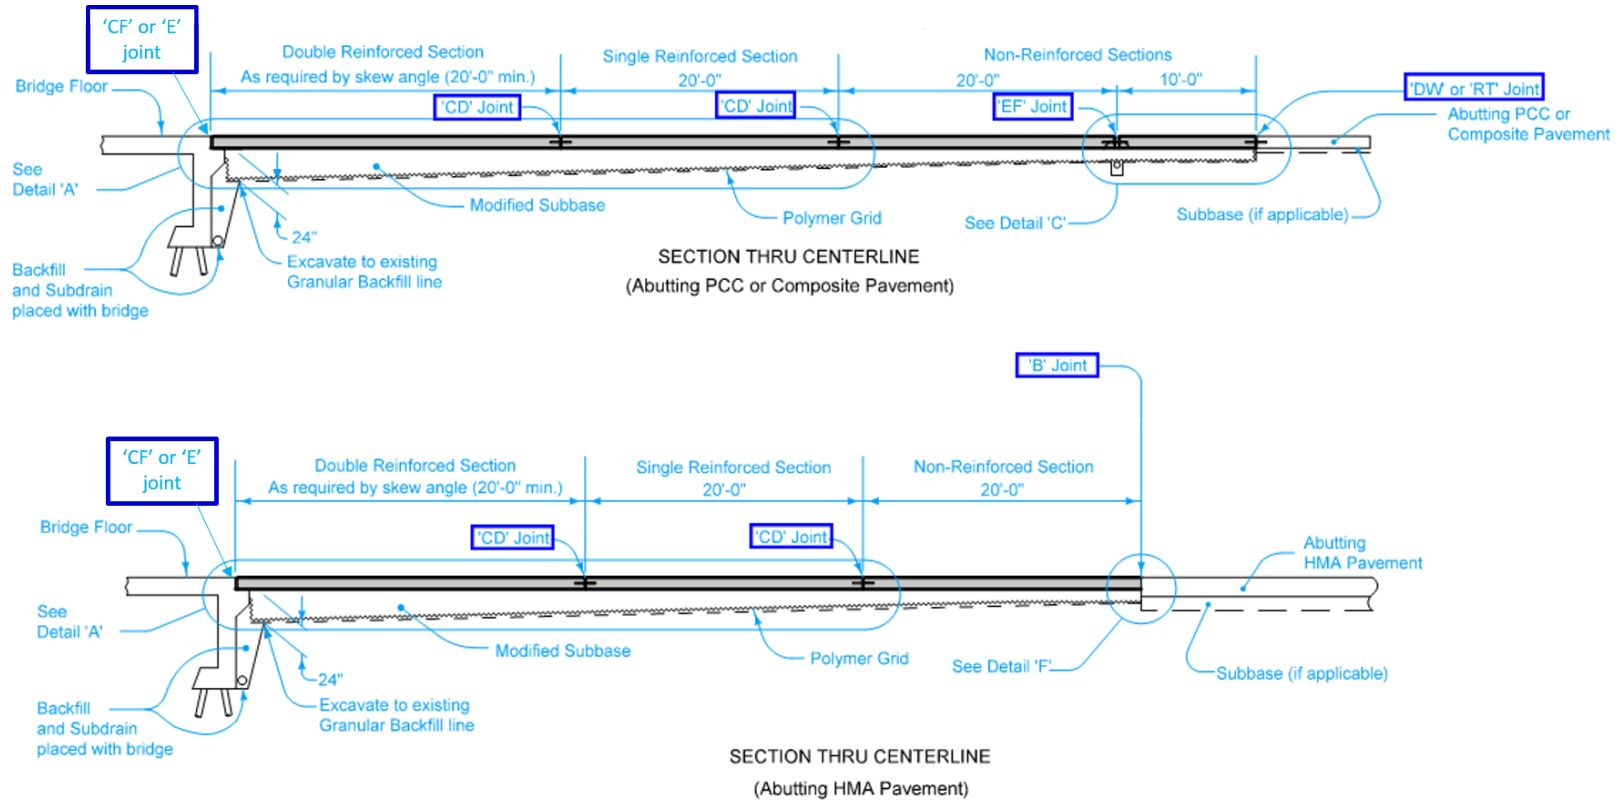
Section views of the approach slabs from the Iowa DOT standard (IowaDOT Standard Road Plans).
